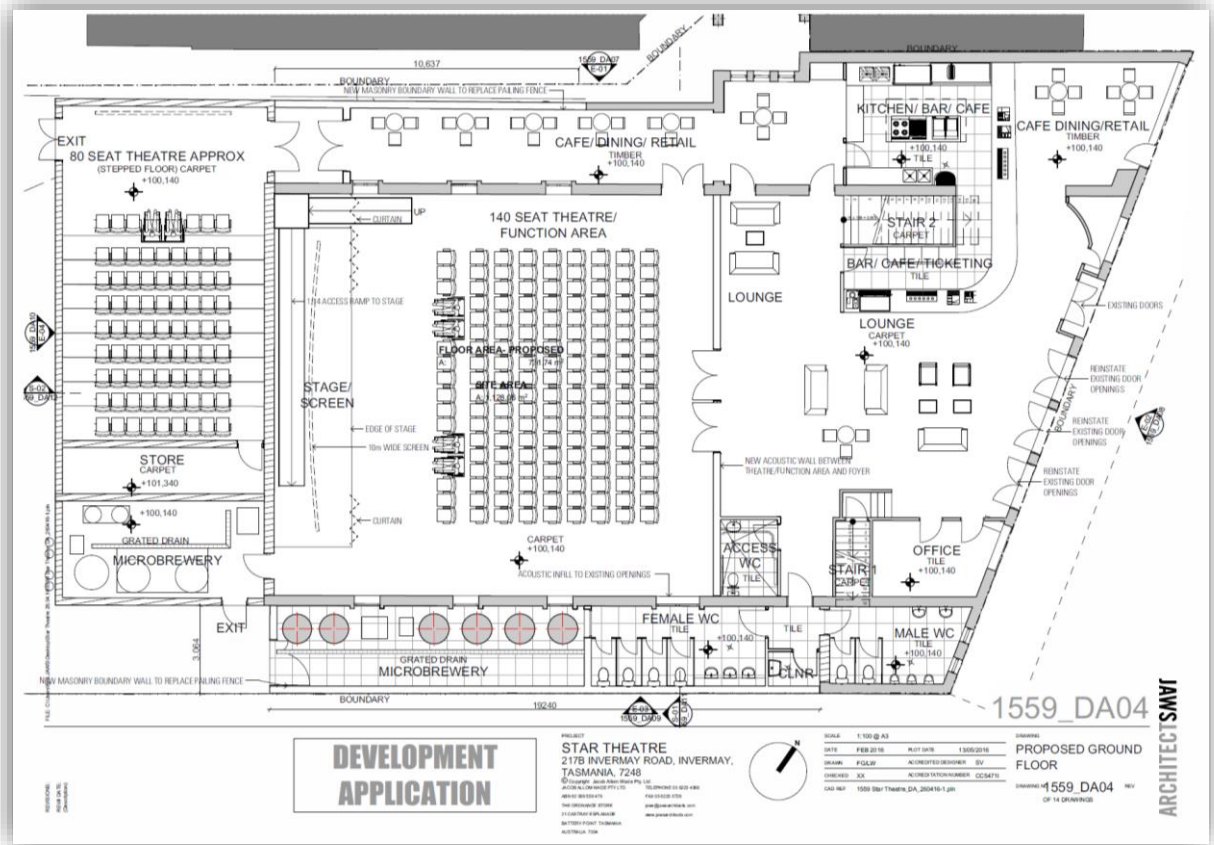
Proposed floor plan for the Star Theatre redevelopment.
